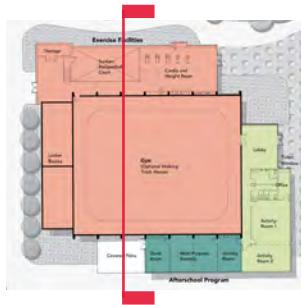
Building section through proposed racquetball court, gymnasium, and After School Entry space
